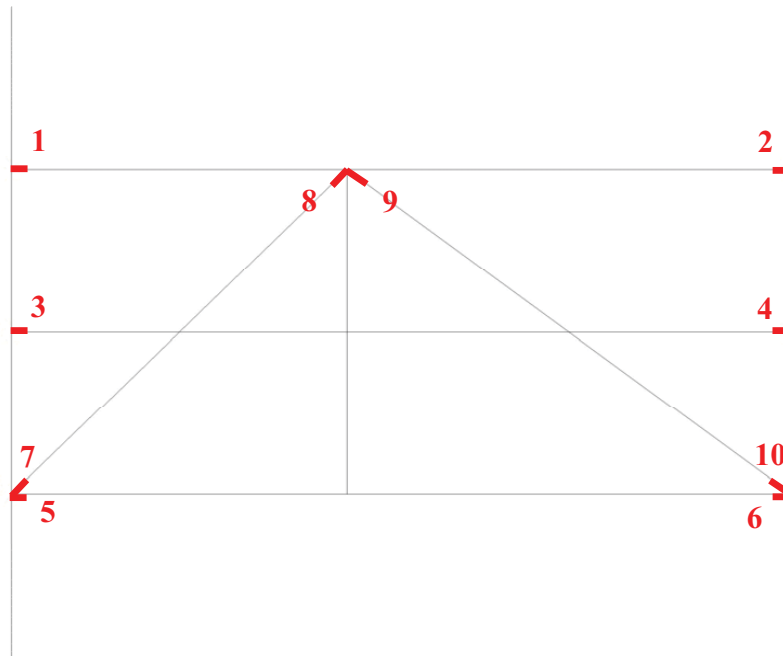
The image shows the locations on Truss 2 where the section forces were monitored.
